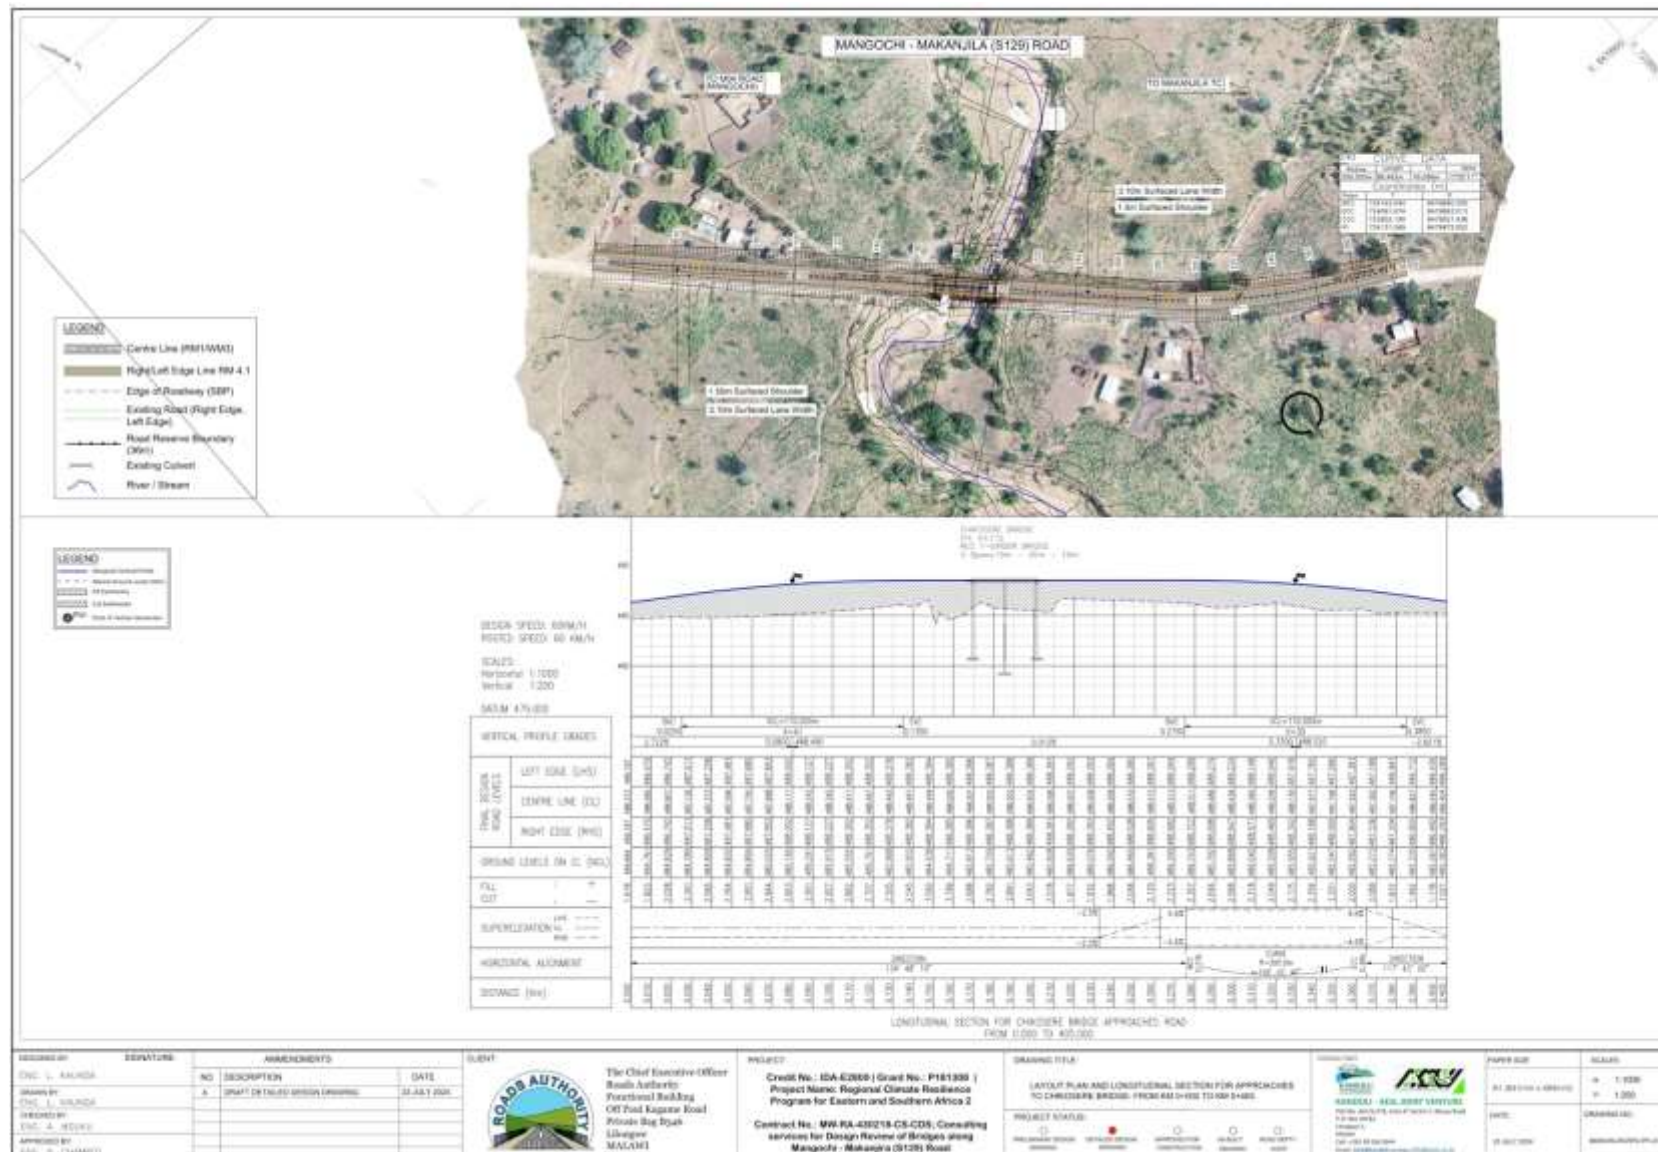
Chikosere Bridge Layout Plan and Longitudinal Section for Road Approaches
